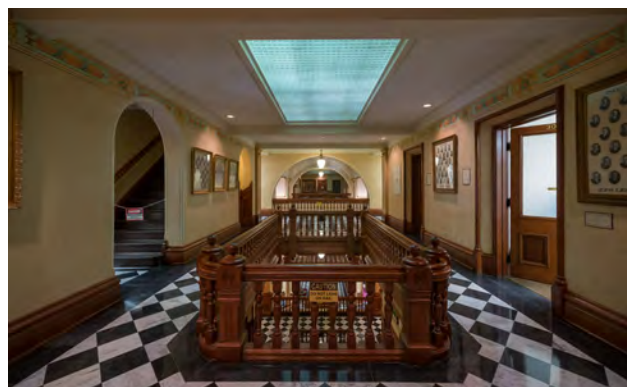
Non-Historic Lighting at the Former Laylight Location at the Third Floor West Corridor.
